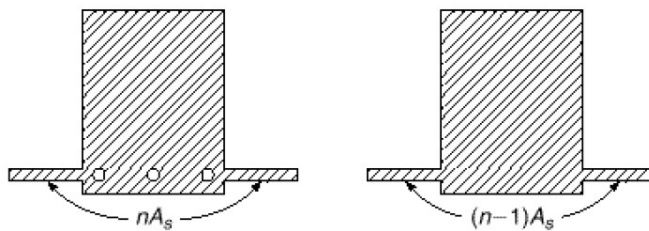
Transformed section for elastic uncracked RC beam.
